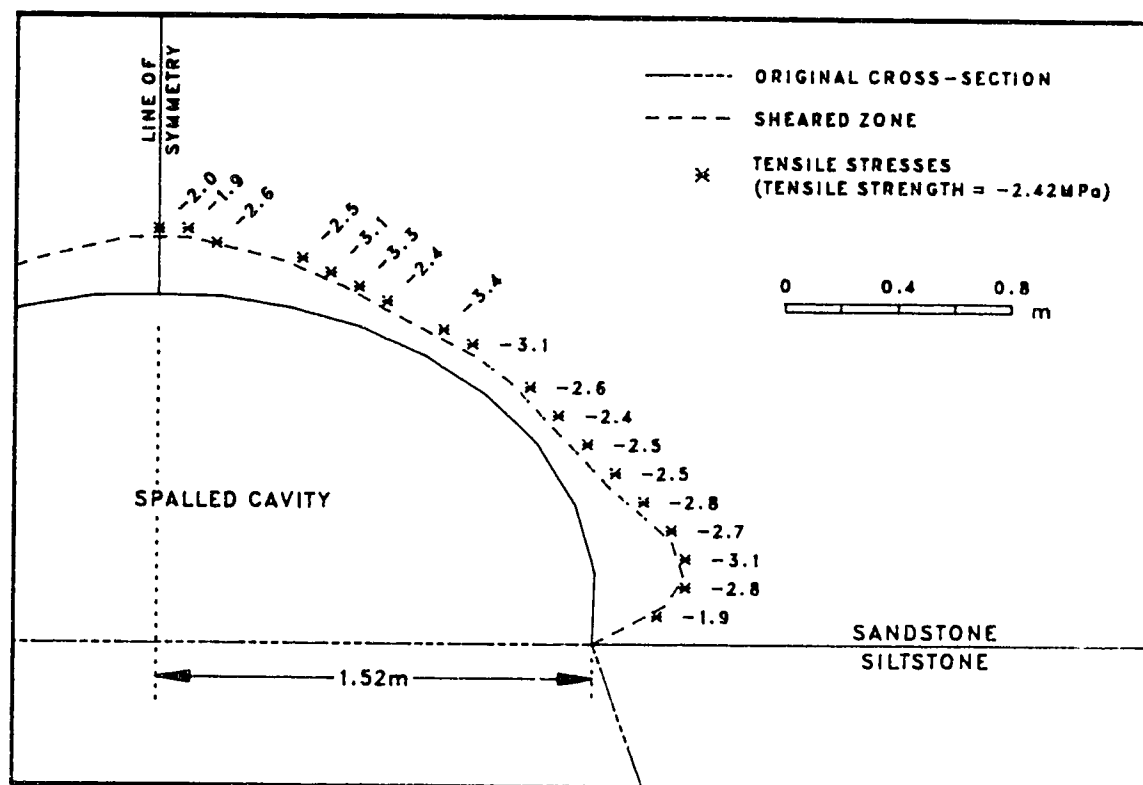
Tensile Failures Around the Cavity - Infinite Spalling
